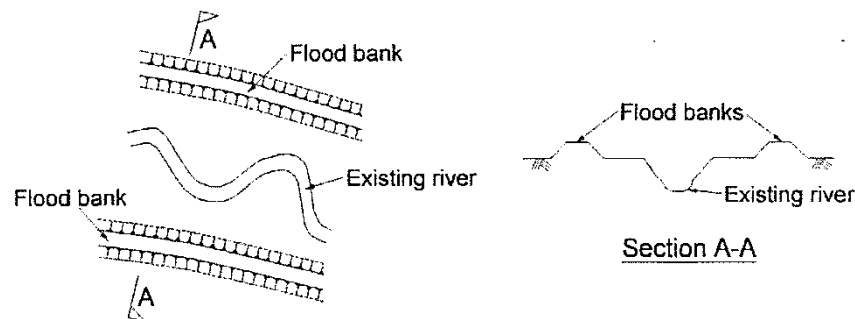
TYPICAL ARRANGEMENT FOR DISTANT FLOOD BANKS
